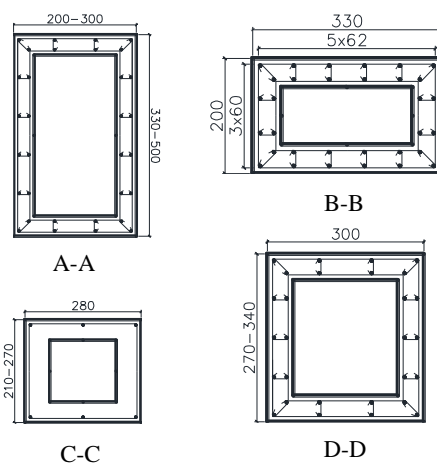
Reinforcement design of the bridge tower (unit: mm)
